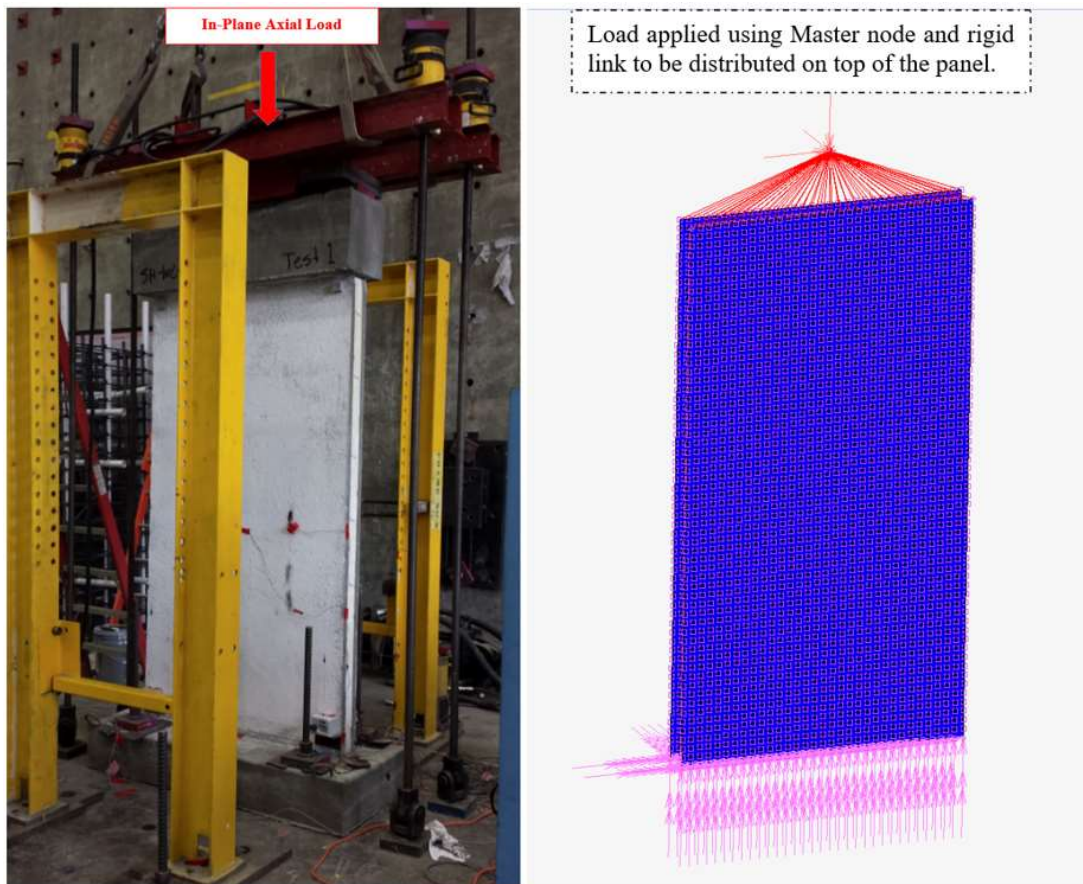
Left: Typical Wall Test Setup under In-Plane Axial Loading at UCI,
